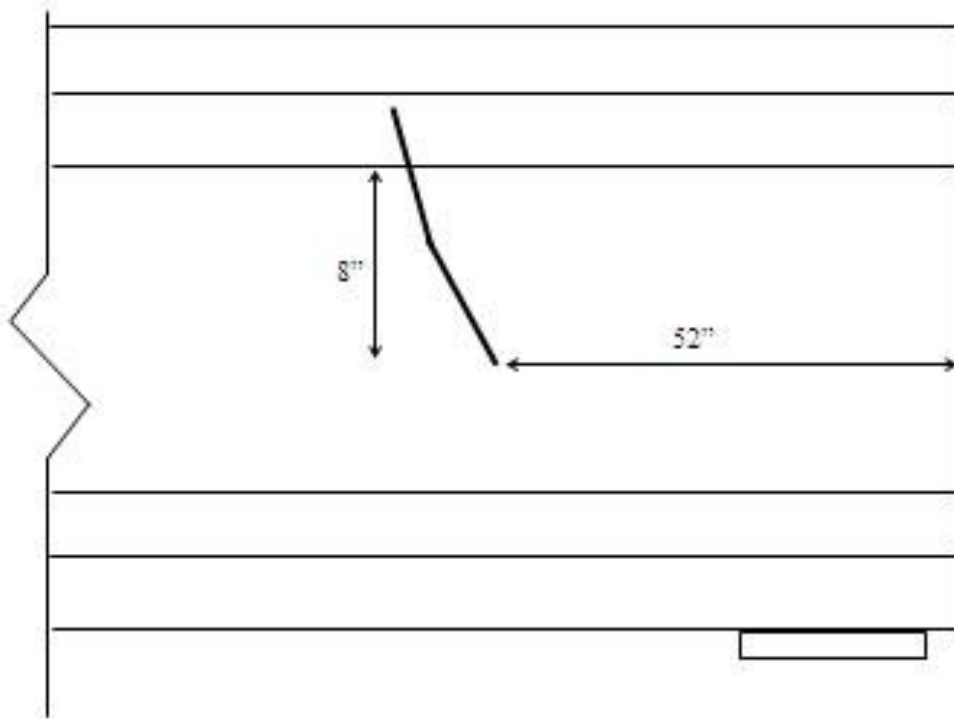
Crack diagram for south span girder, north end, 5th beam from east side, east face (#7933).
